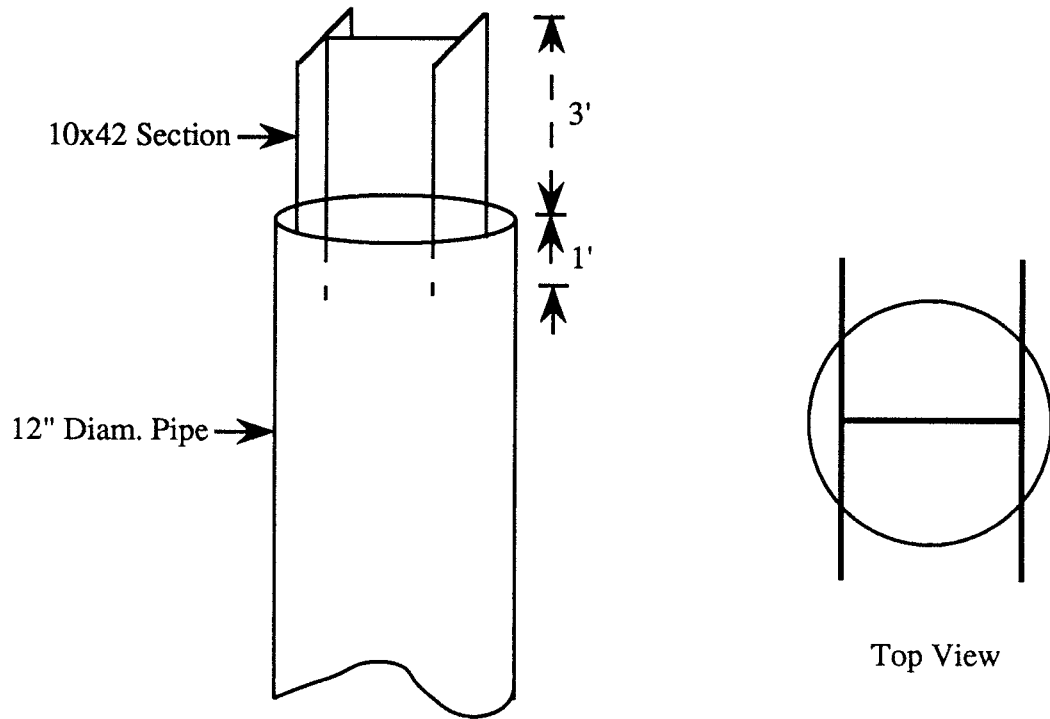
Pile-Vibrator Connection Detail, Pioneer Freezer Site
